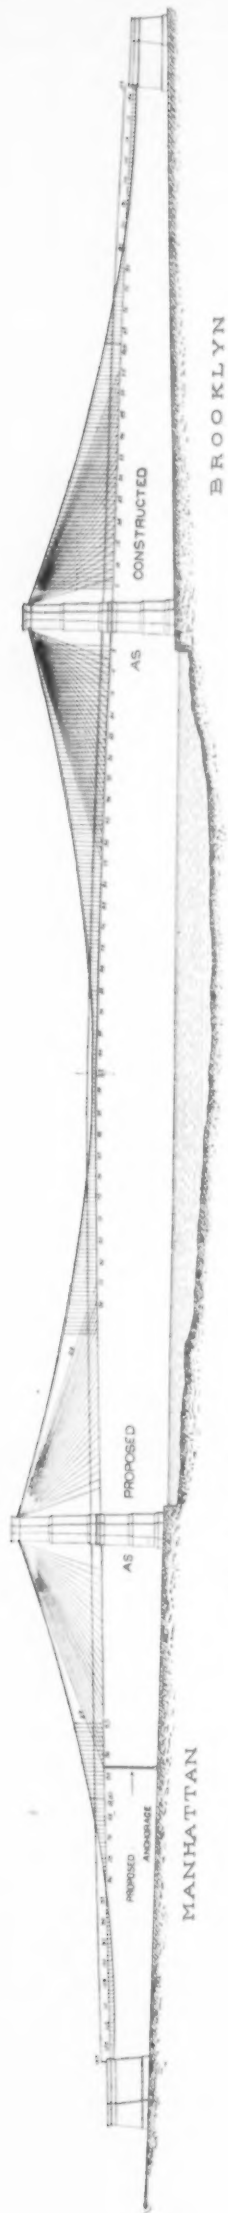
PRESENT AND PROPOSED ARRANGEMENT OF OVER-FLOOR STAYS ON THE BROOKLYN BRIDGE.
